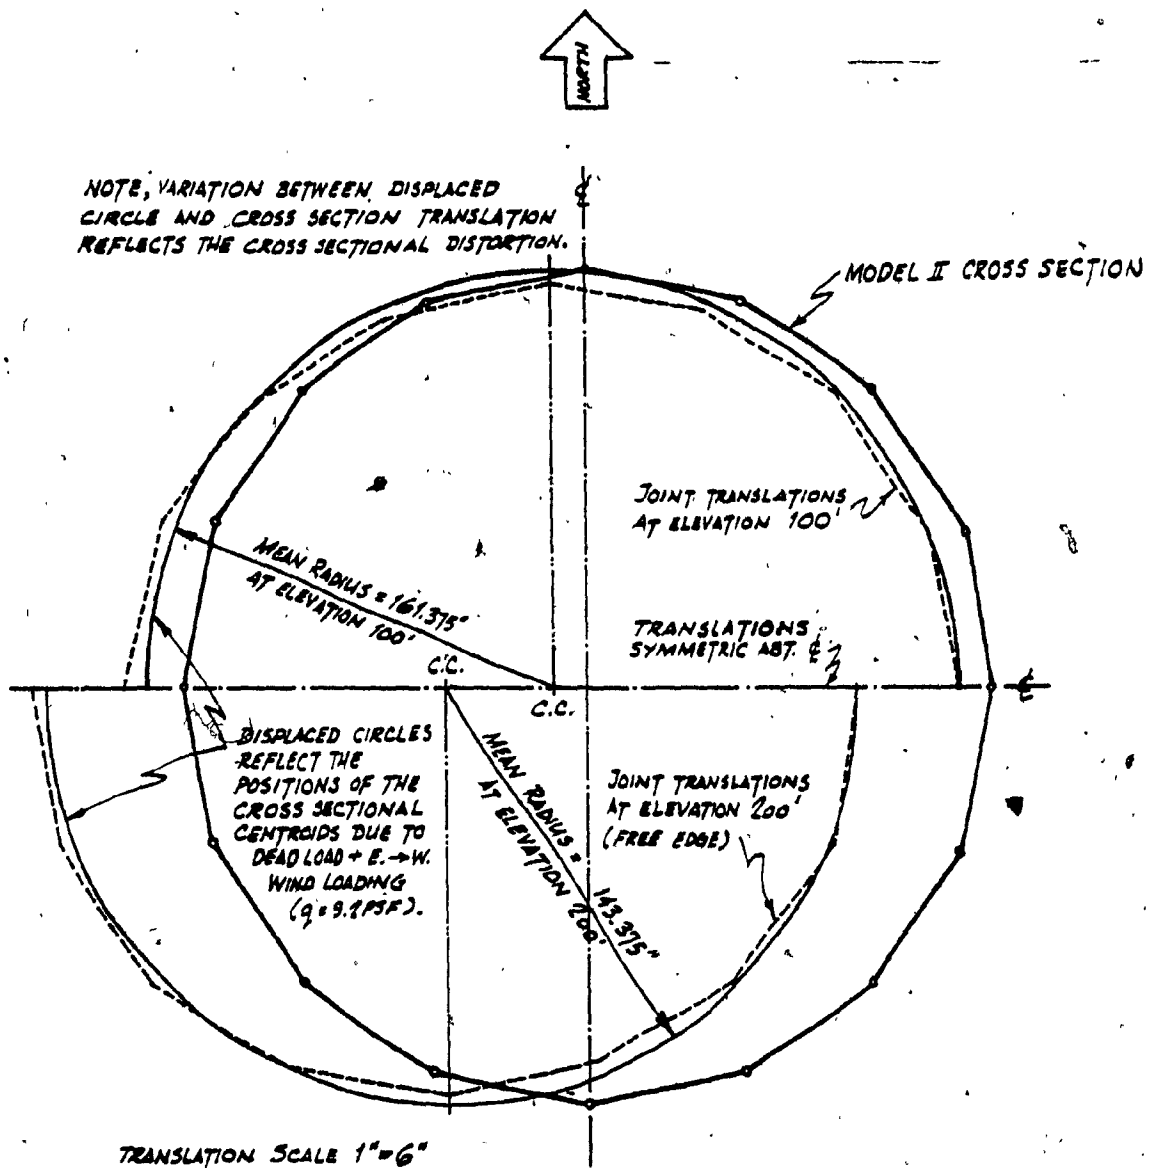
JOINT DISPLACEMENTS OF CROSS SECTION AT 100' AND 200' ELEVATIONS, MODEL II
